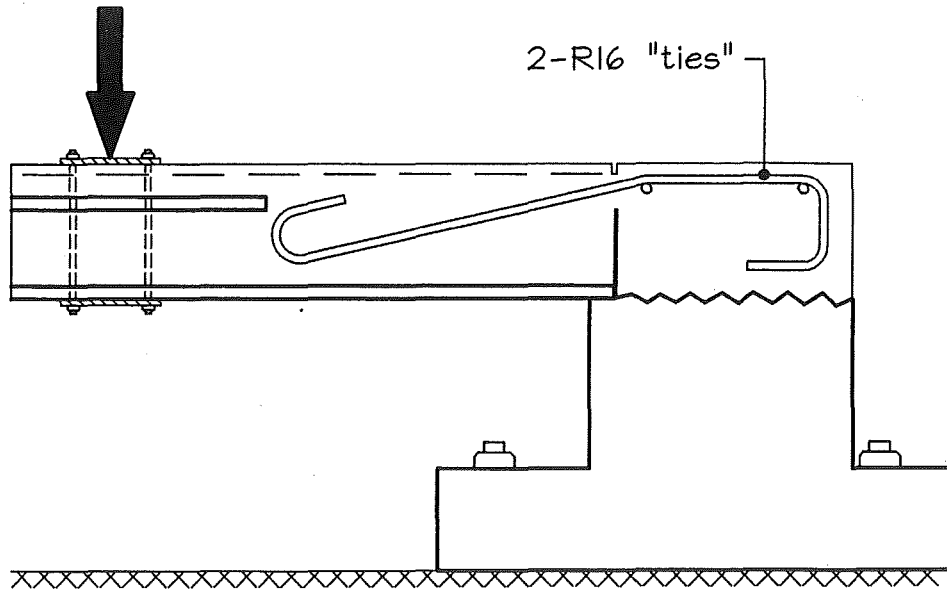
Configuration of CANTI-2 test involving an embedded R16 tie detail
